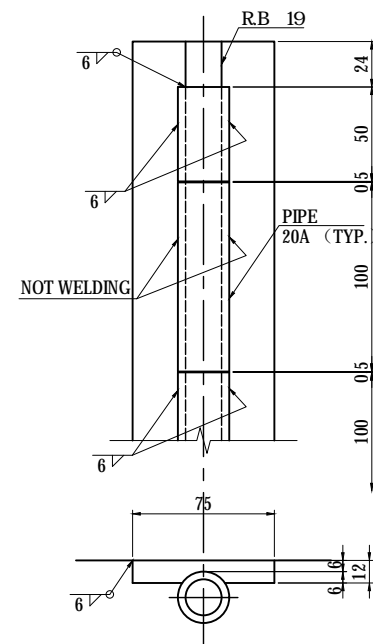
# DETAIL OF MAIN TOWER STANDARD (3) S=1:20
